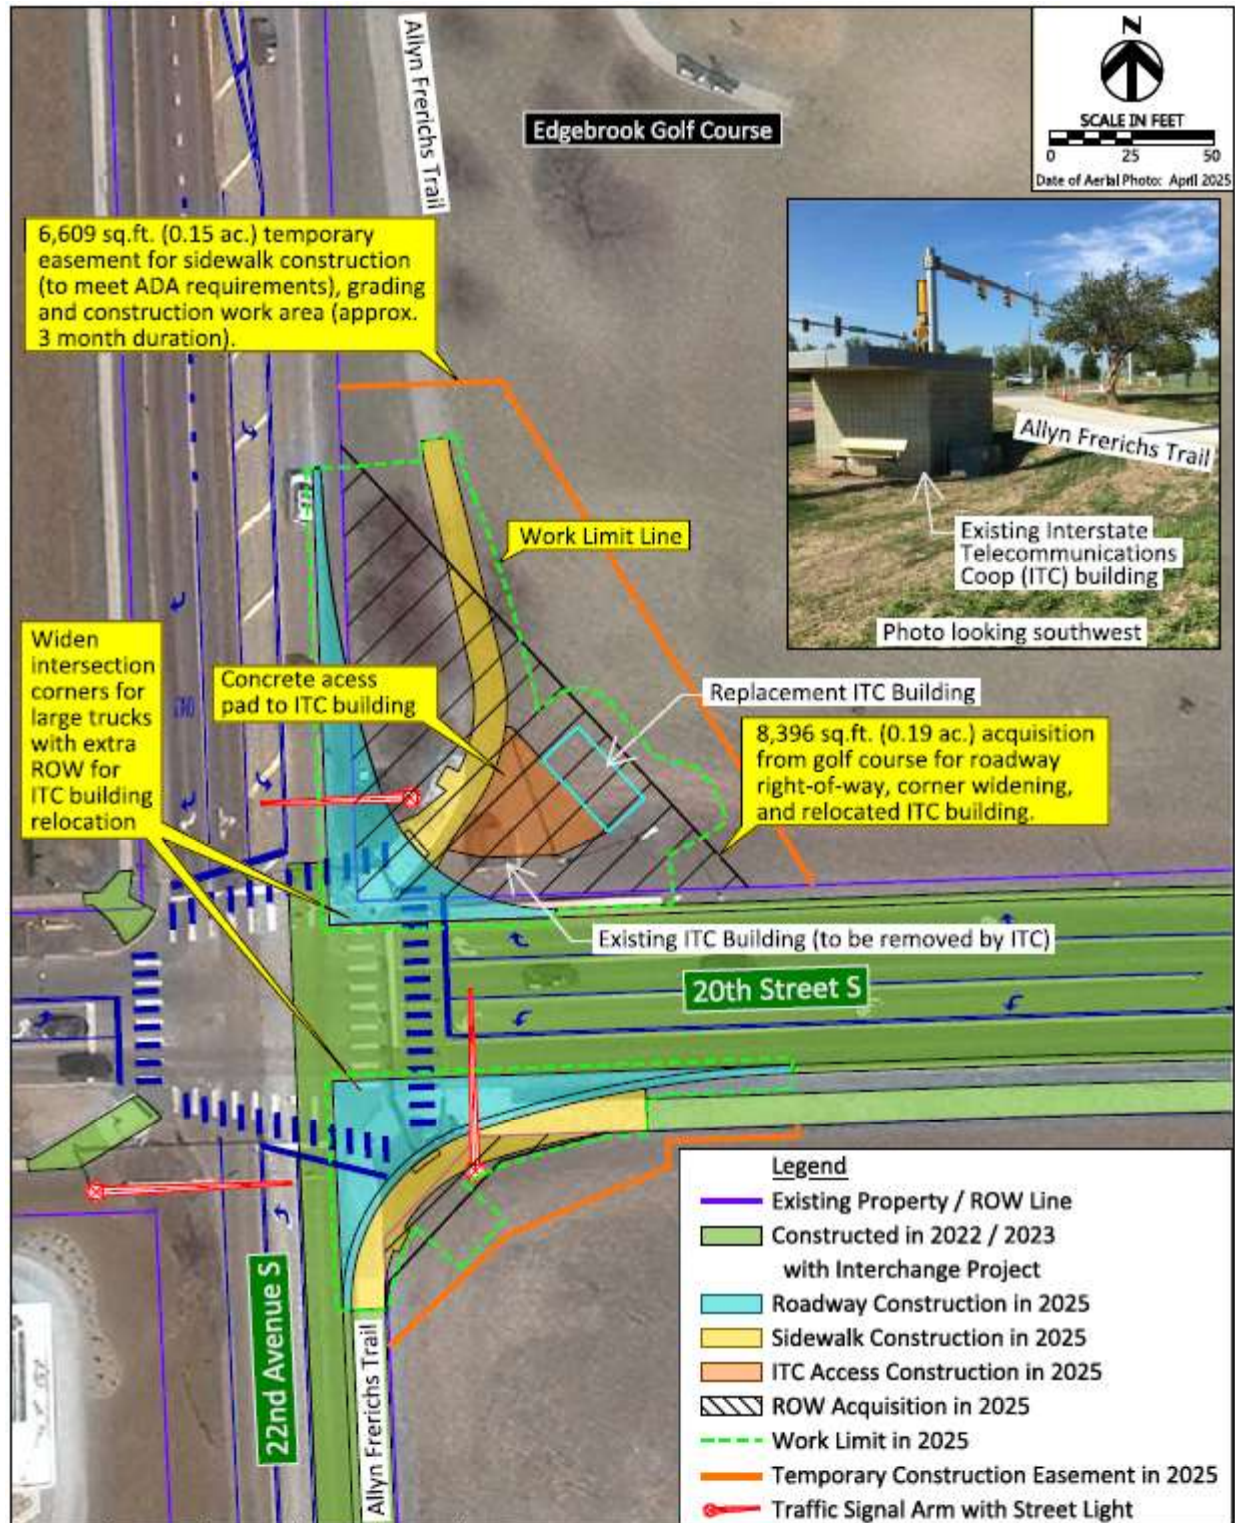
ITC Building, Golf Course, and Trail at the 20th St South and 22nd Ave Intersection
